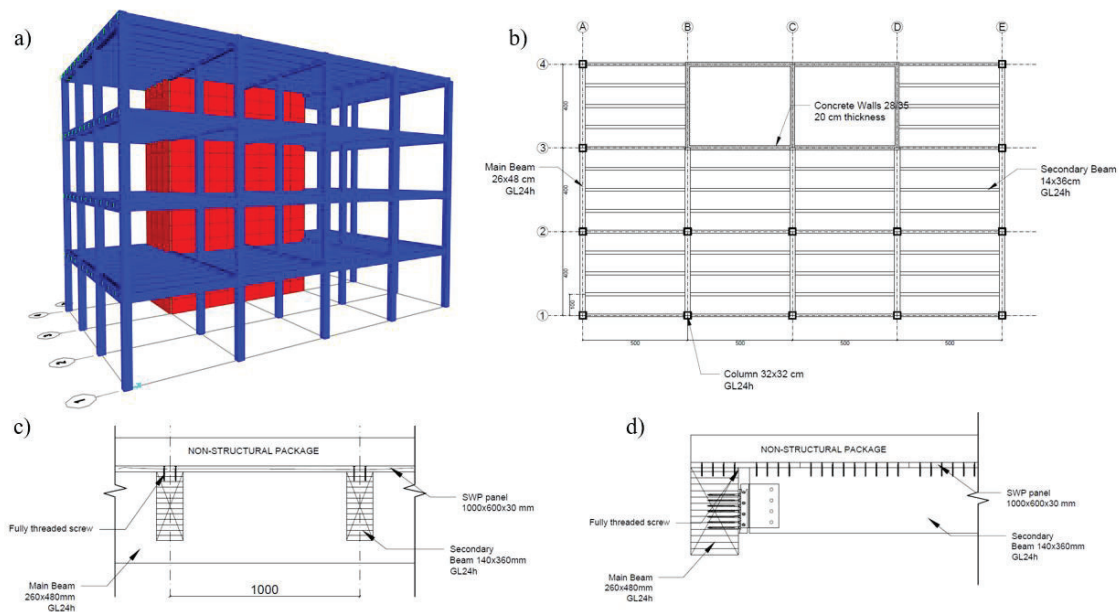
a) isometric view of FEM model; b) building plan floor [cm]; c) and d) construction detail of beam-to-beam connection [mm]
